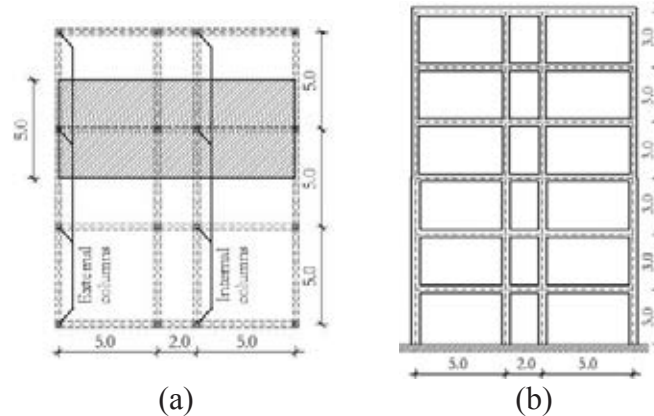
Geometry of the reference building: (a) plan view; (b) elevation view.
